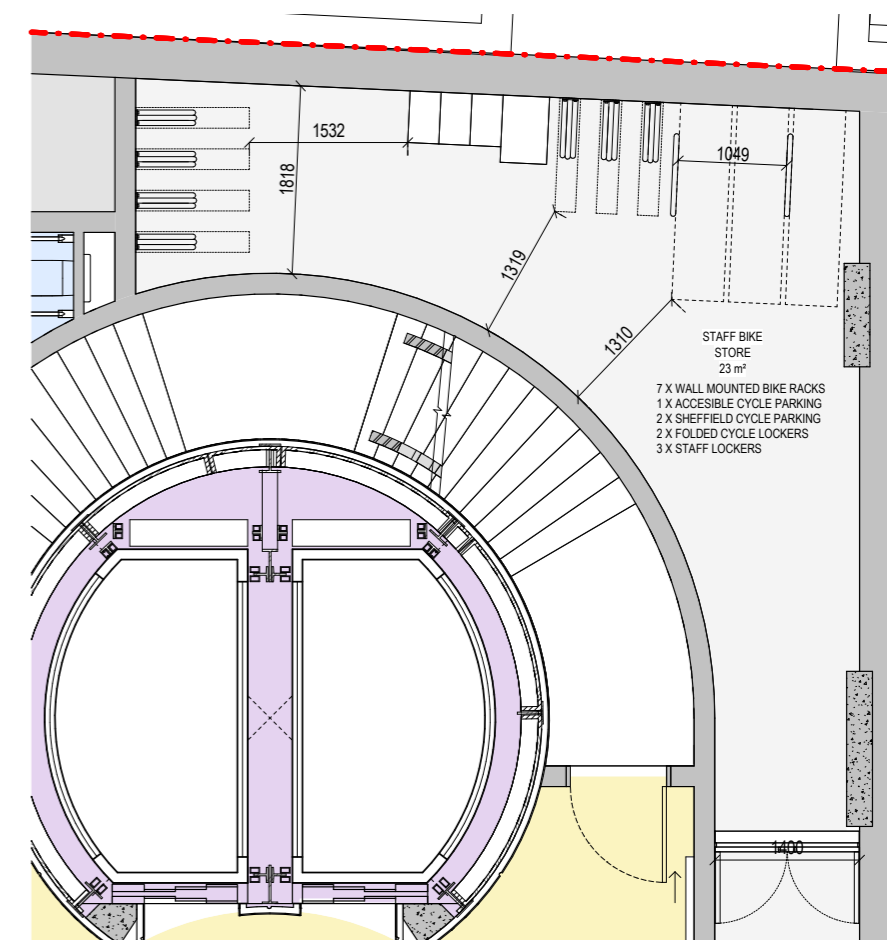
39-40 Furnival Street - Ground Floor Bike Store
